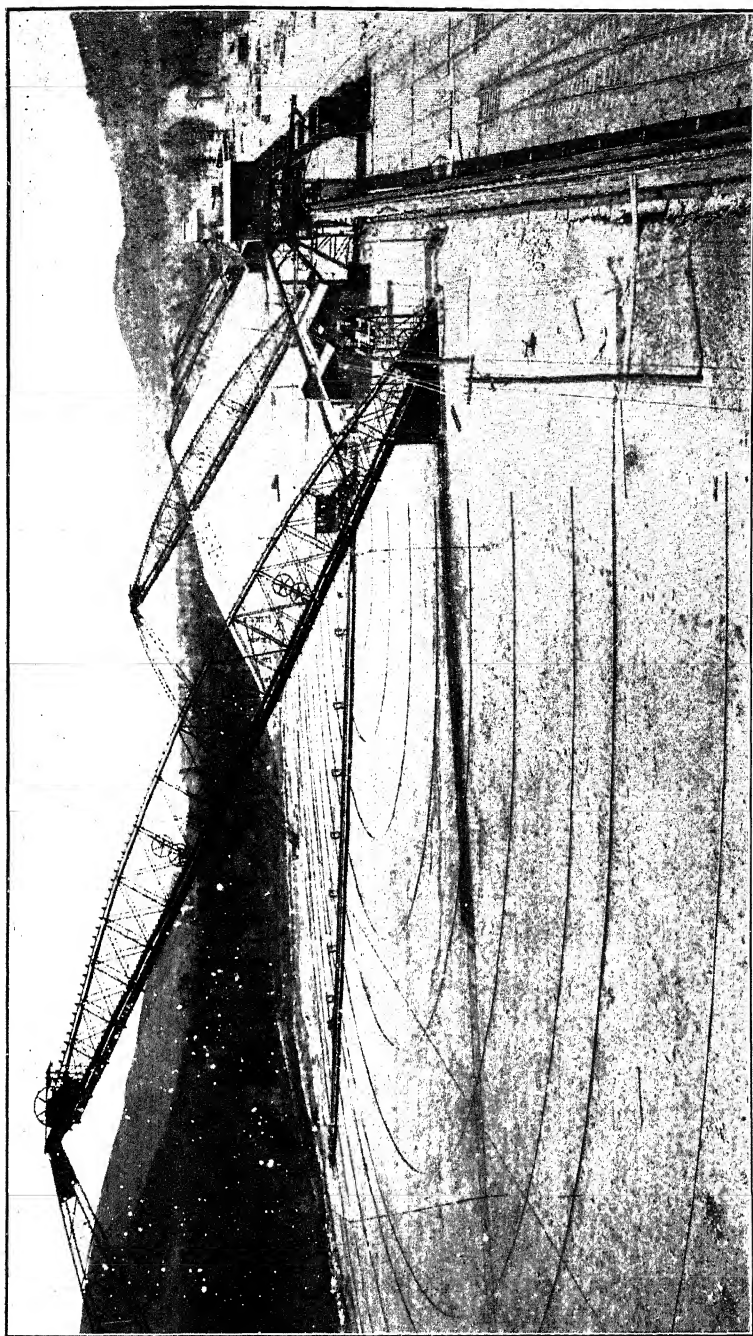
STANDARD DODGE PLANT, HAUTO, PA. SHOWING TRUSSES, RELOADING-TOWERS, AND SWINGING-RELOADER.
